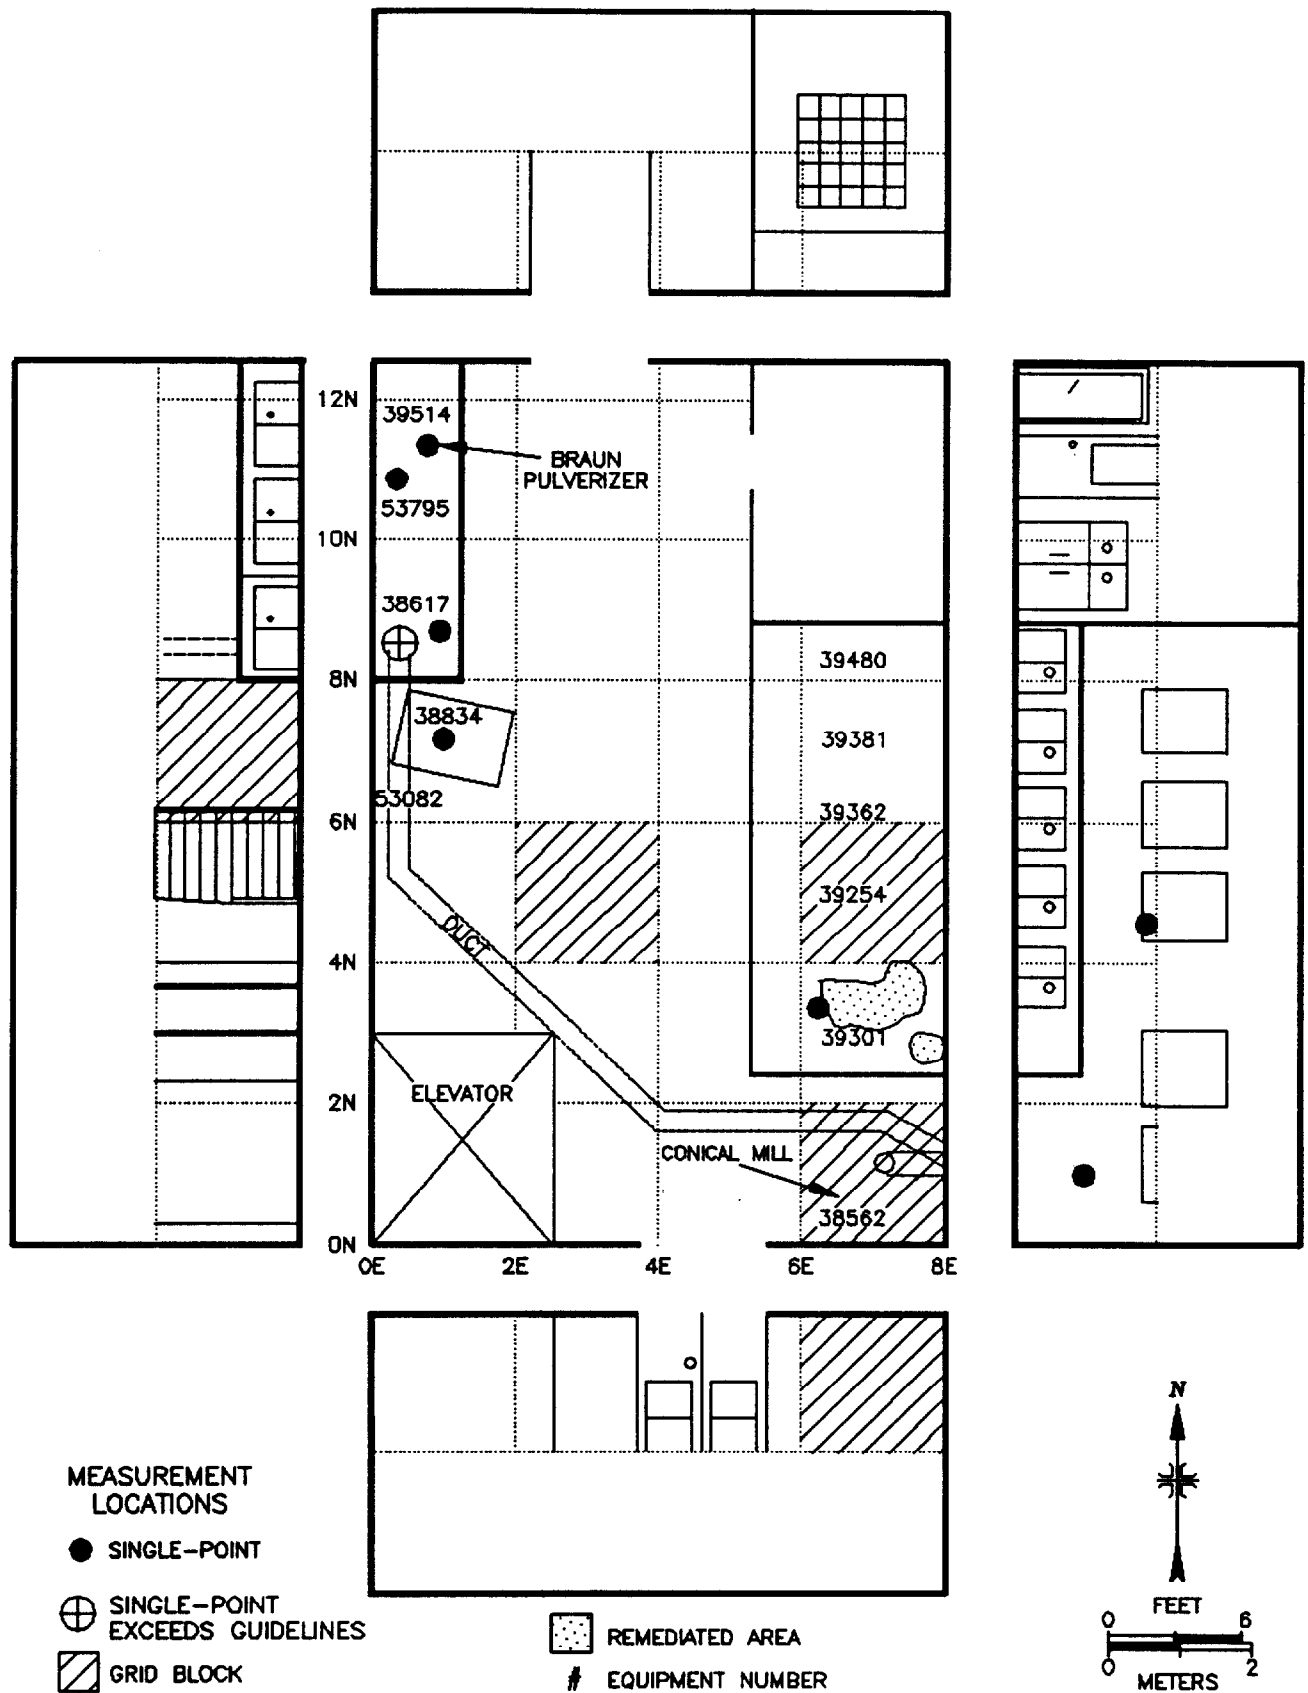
Building 23, Crusher Room, First Floor – Remediated Areas and Measurement Locations
